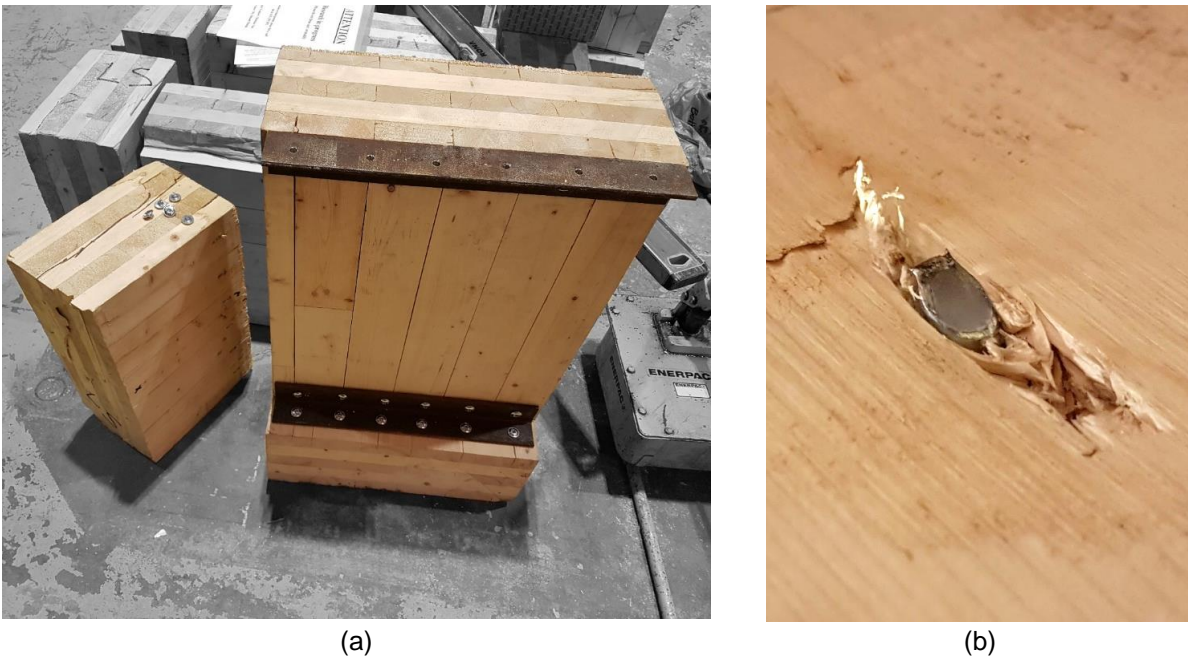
Representative Failure Mode of Custom-Manufactured Angle: (a) Specimen After Testing; (b) Screw Failure and Wood Crushing
